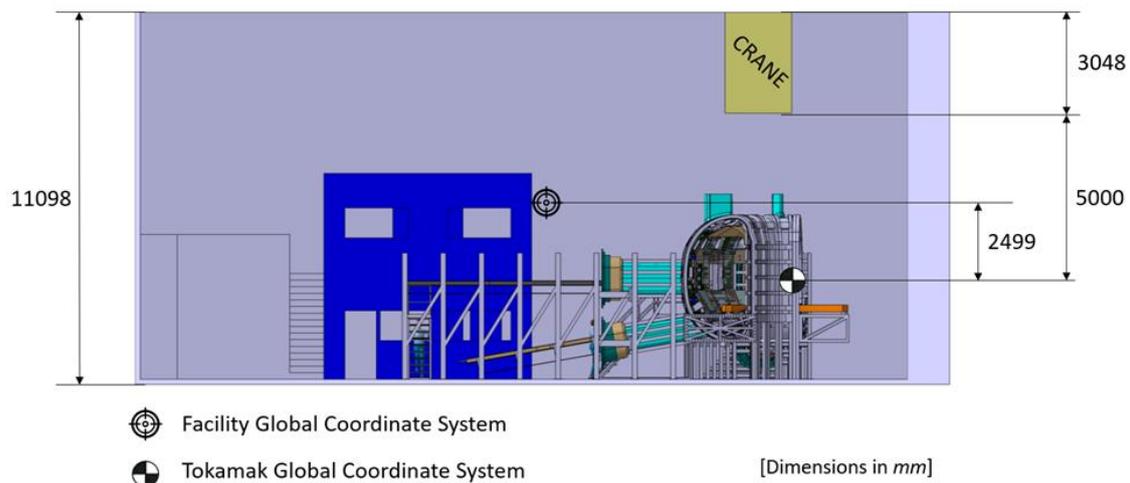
Mockups position in the DTT RH Facility building, lateral view.
